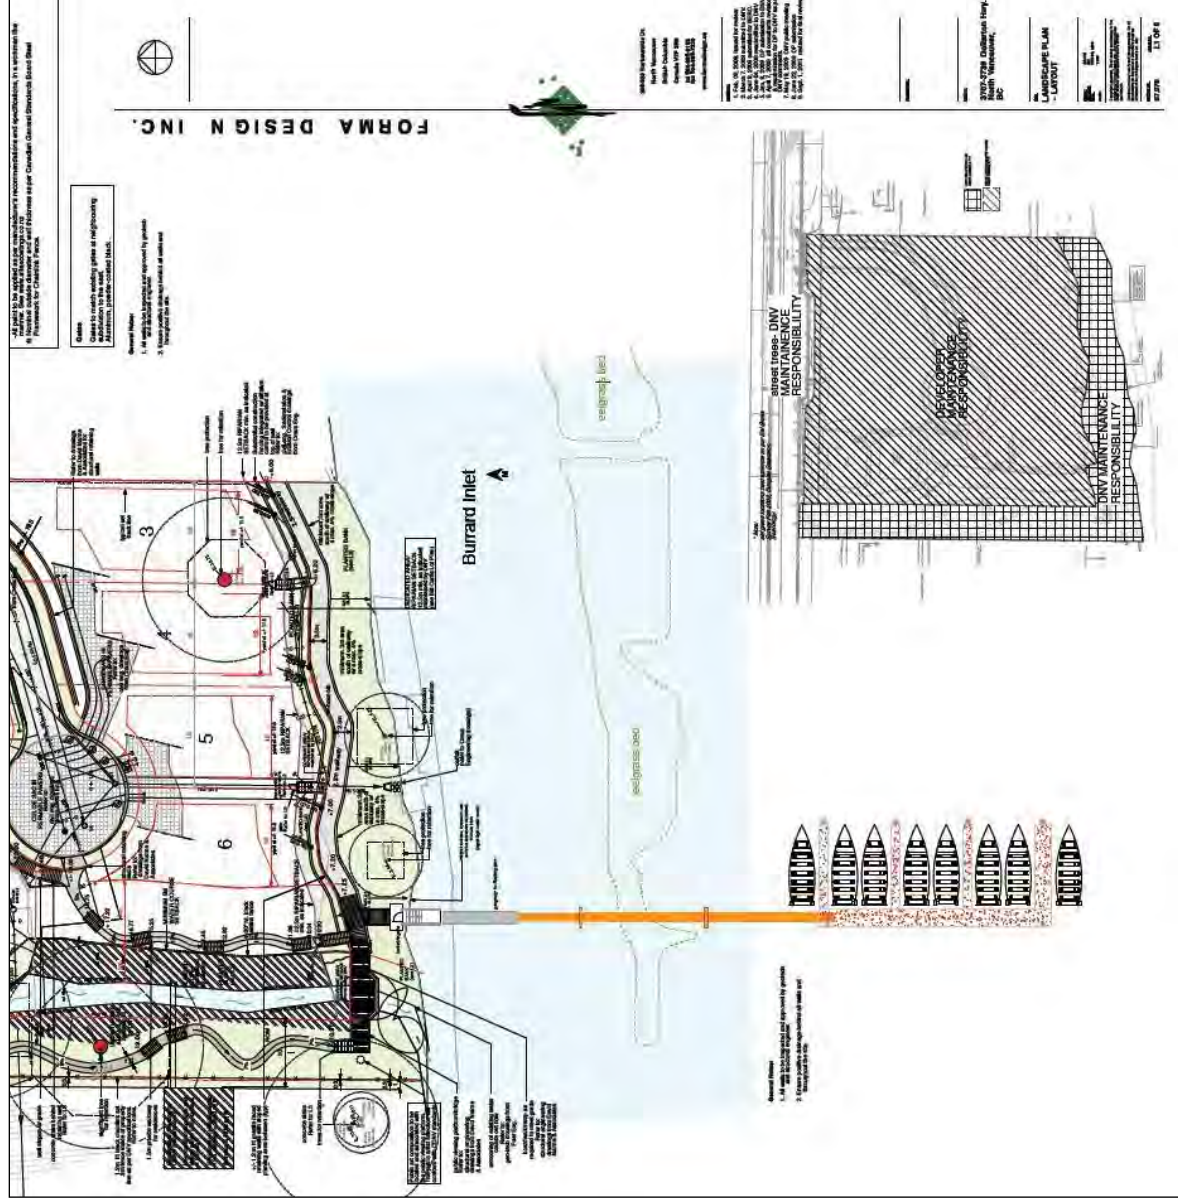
Map showing the configuration and location of the original proposed dock design at 3707 Dollarton Highway on the larger original proposed development plan map as assessed under Site Alteration Permit 2012-0061.
